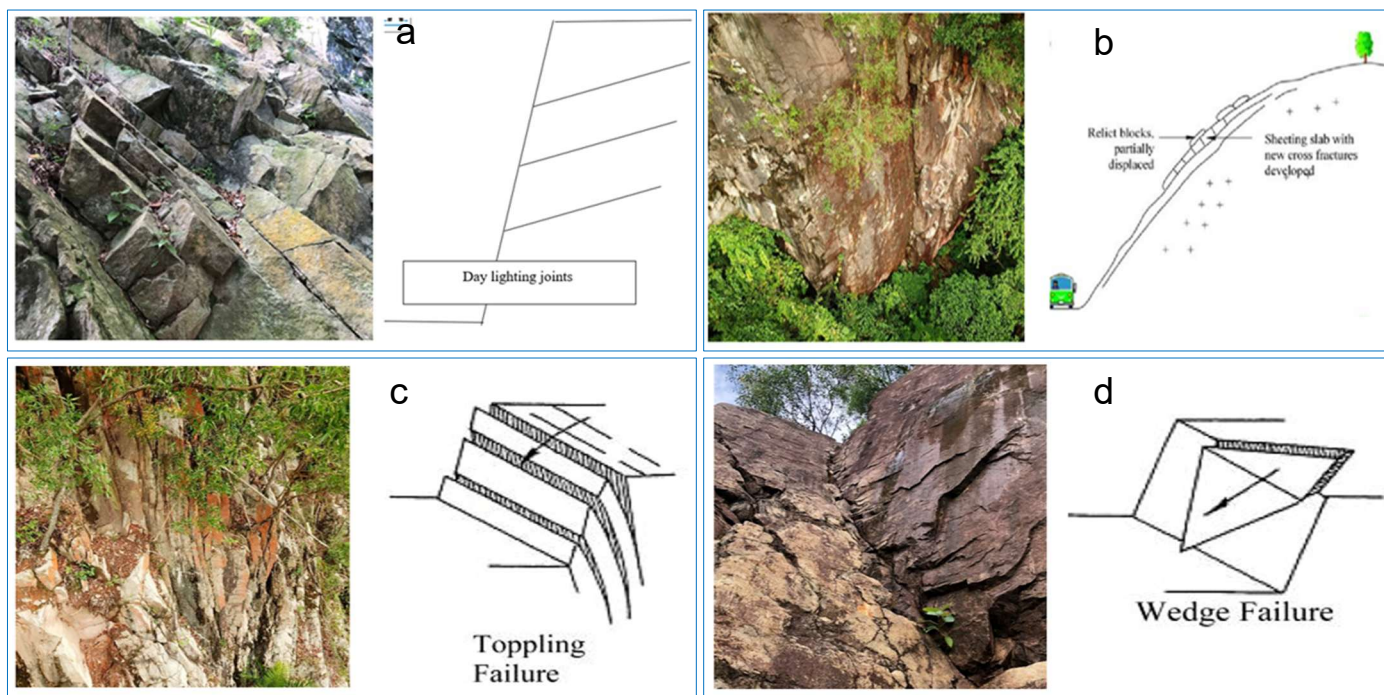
Types of Geological structures-controlled rock slope failure observed at Project 2: a) Failure by Daylighting joint, b) Failure along sheet joints, c) Toppling failure and d) Wedge failure
